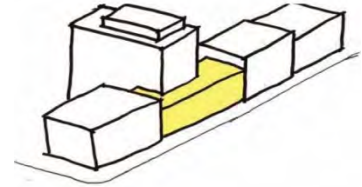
The base massing of this taller building should complement setbacks and heights of adjacent buildings.
